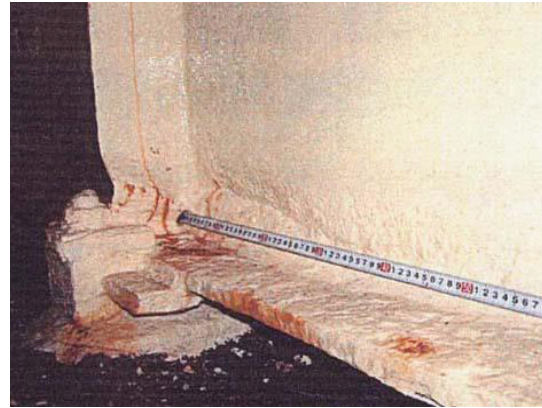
Buckling failure of girder due to excessive section lost at bearings
